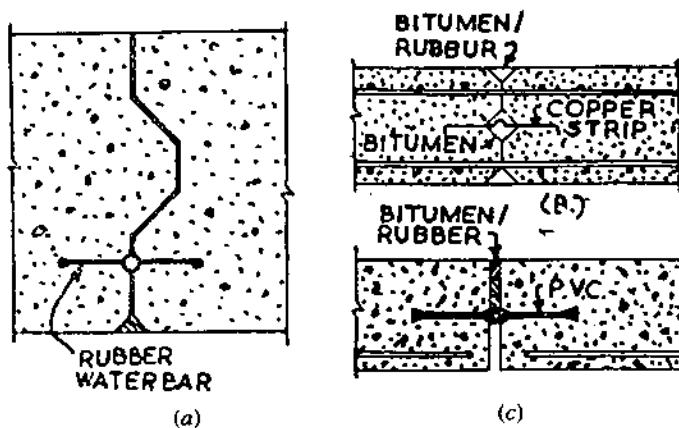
(a) Joint for mass concrete water retaining structure,
